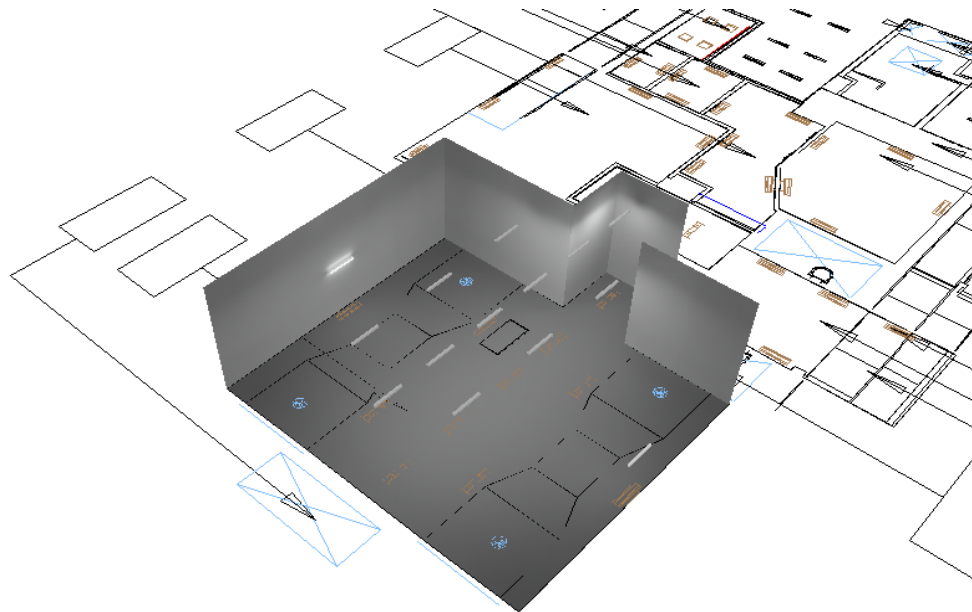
Typical Tunnel Ventilation Fan Room 3D Rendering
